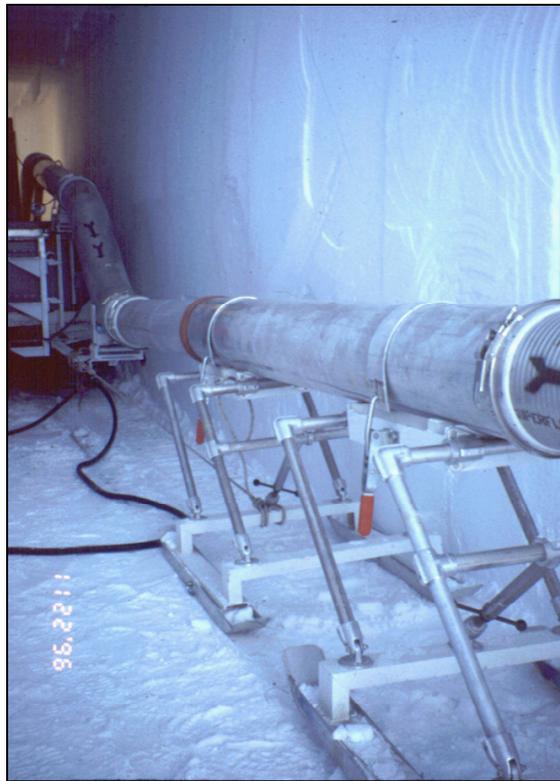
Single-expansion duct unit mounted to tunneler (photo, M.R. Walsh).
